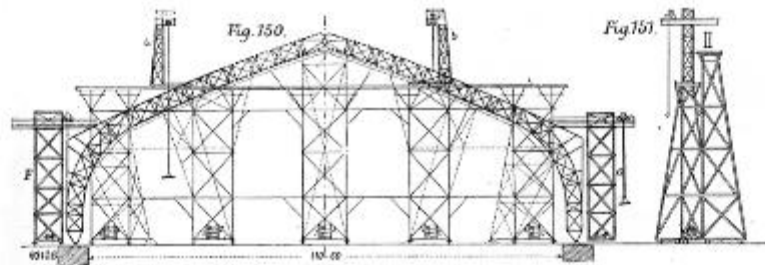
DETAILS OF ROOF OF MACHINERY HALL AND OF SIDE GALLERIES.
